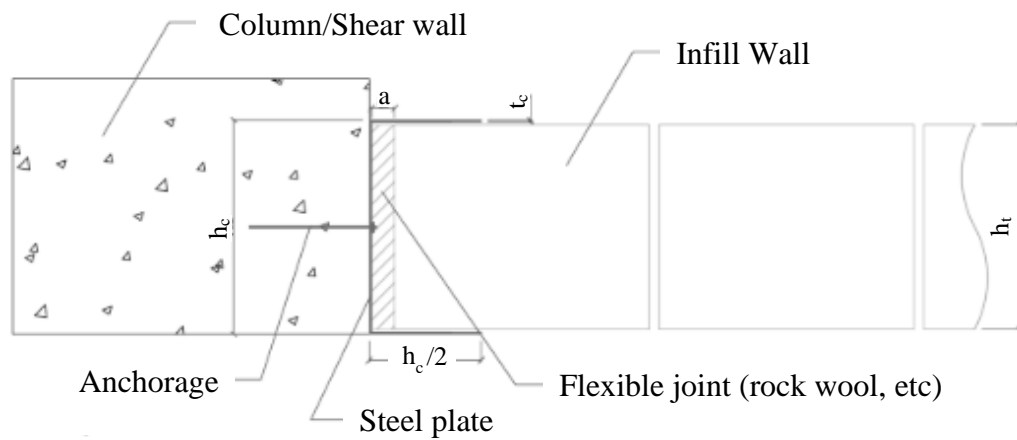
A sample detailing for flexible joints, TBEC (2018)
